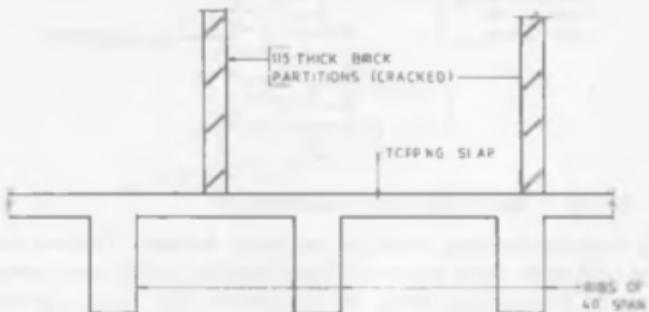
Cracking of brick partitions supported on a long span ribbed slab.
